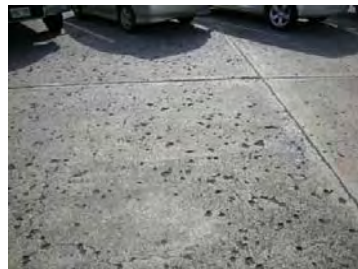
Damaged Area "h." Photo taken looking northeast.
